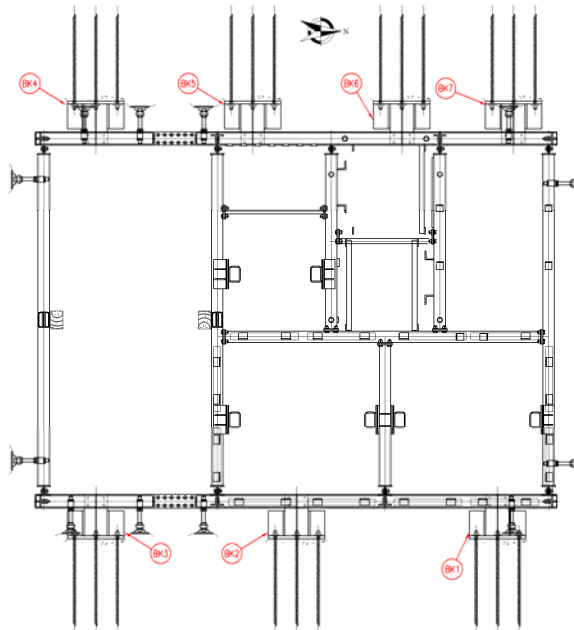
Typical bearing bracket arrangement below the 3650 level of the shaft
